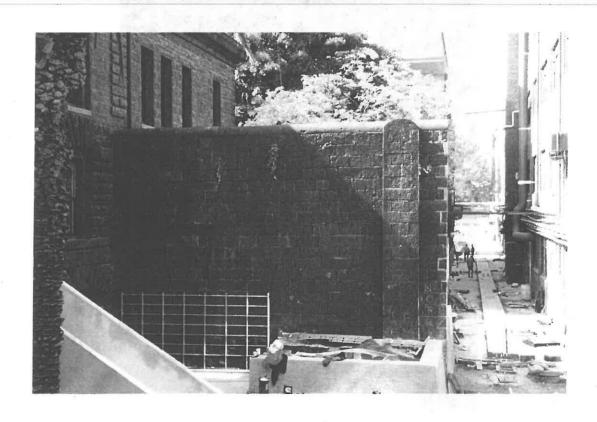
Original wall of the Old Melbourne Gaol and West Elevation of the West Wing
